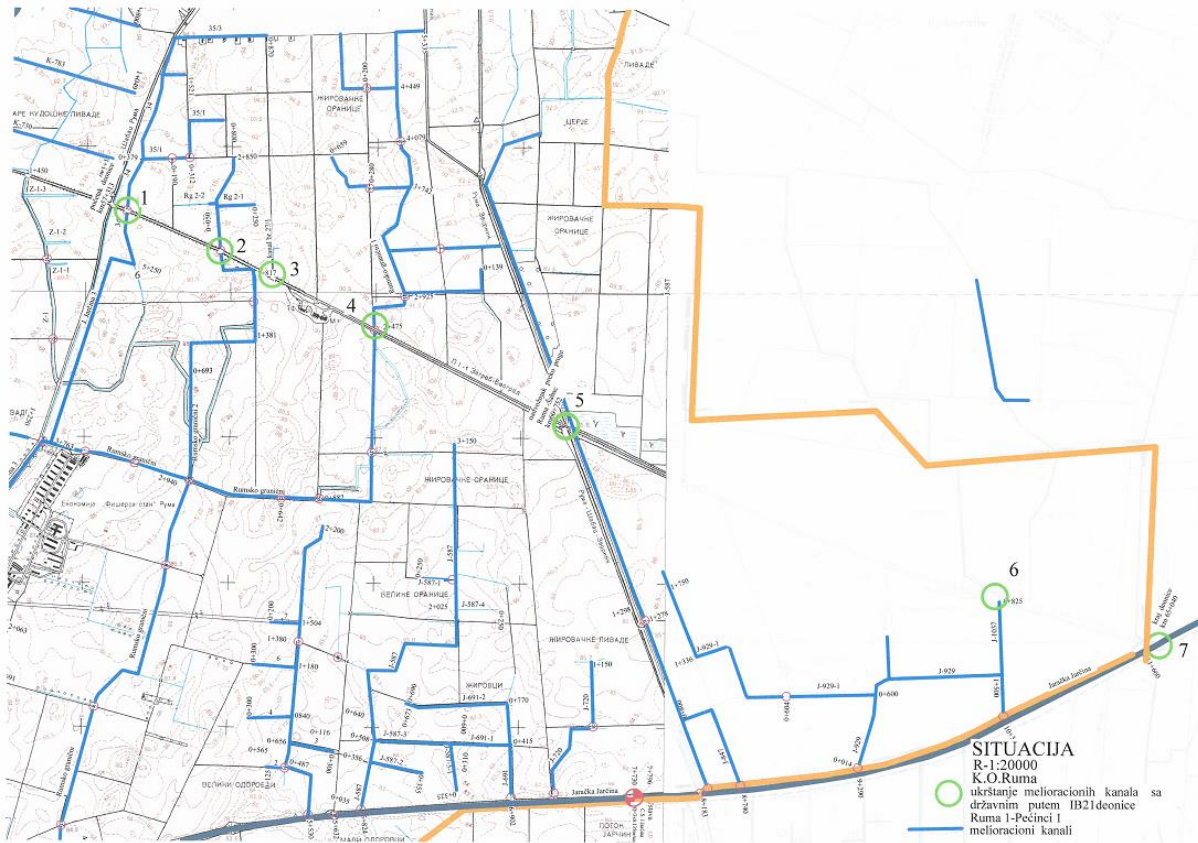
The places of intersection of the land-reclaimed canals with the subject section
